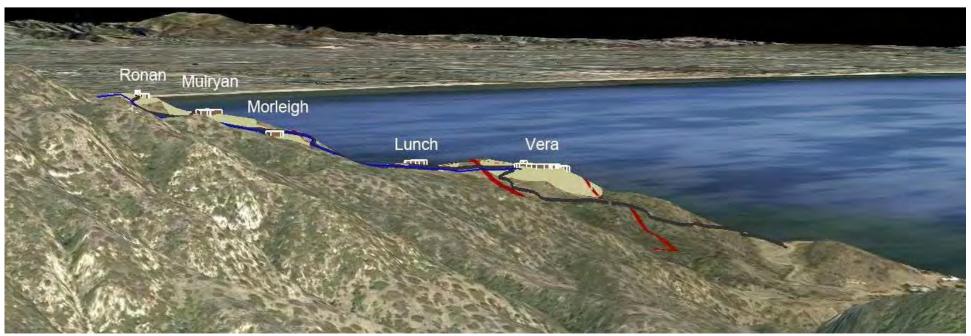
Proposed houses, fuel modification footprints, access road and driveways, and water line.
